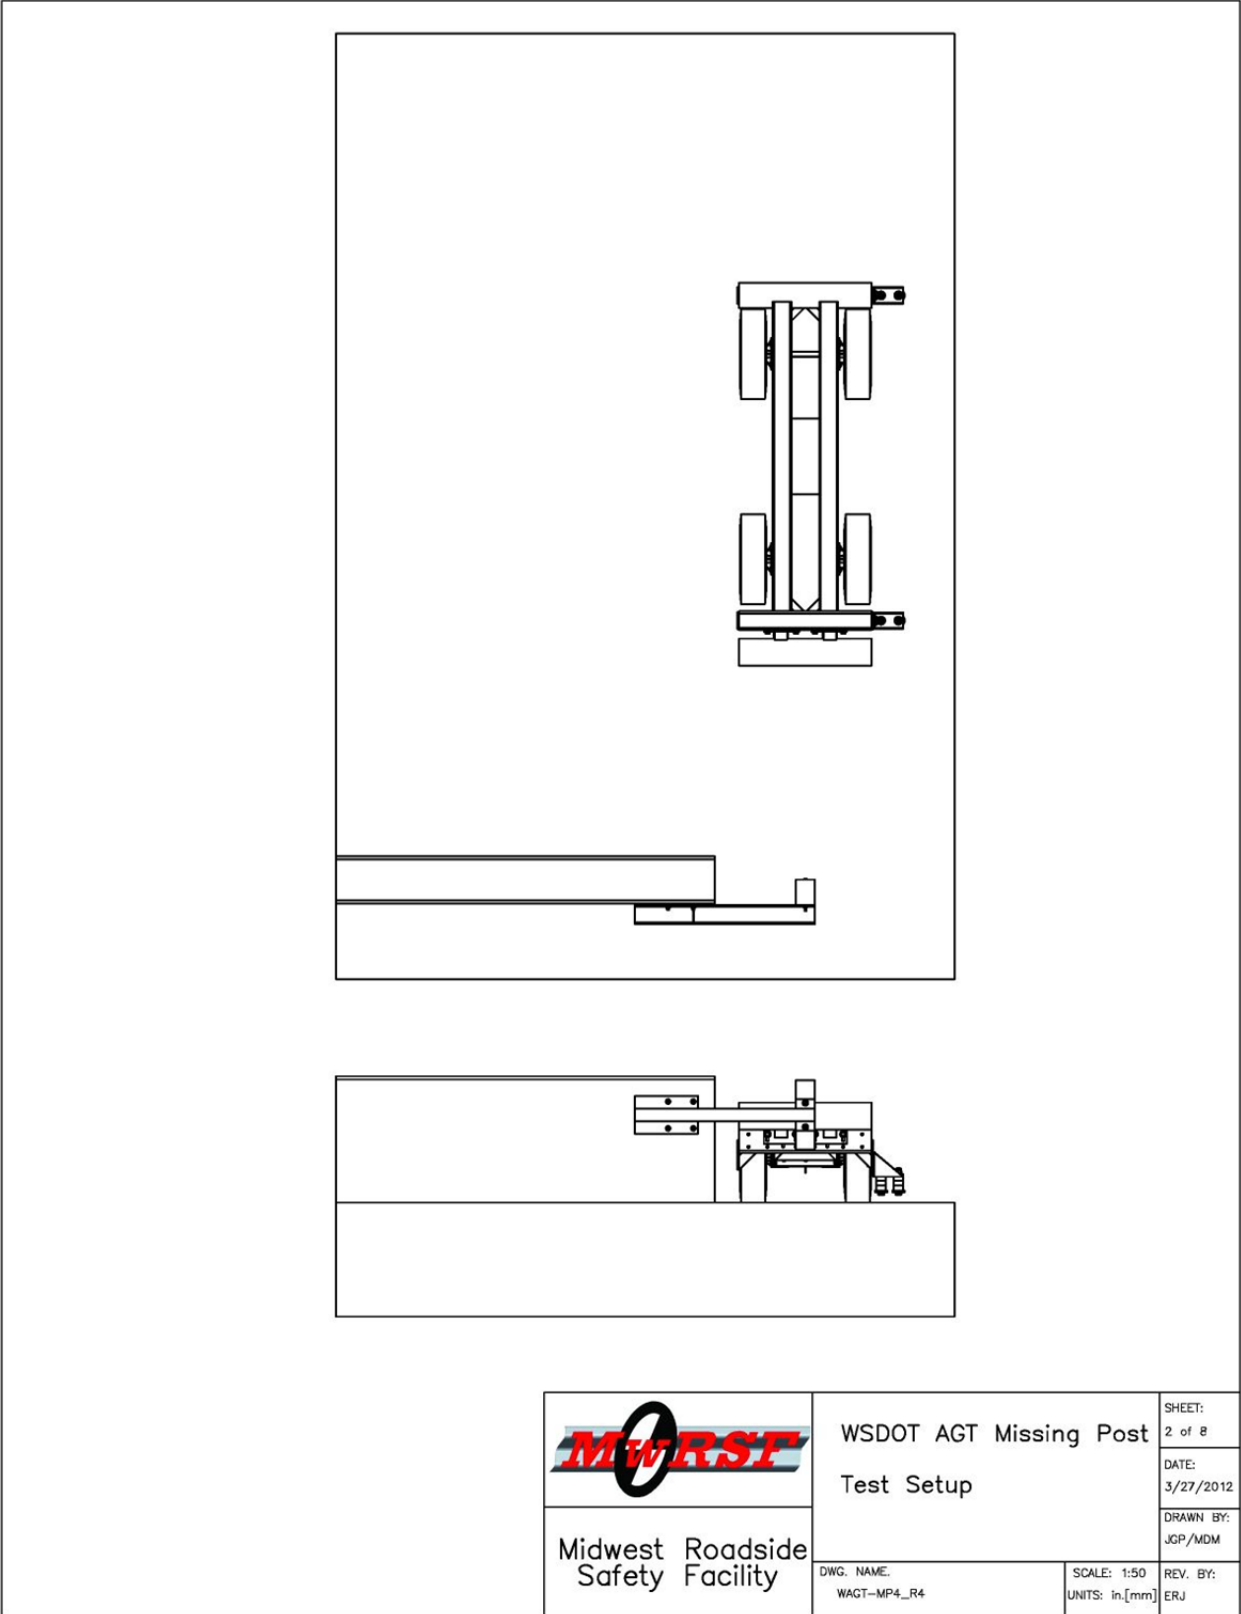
WAGTMP Bogie Testing Setup – Plan View
